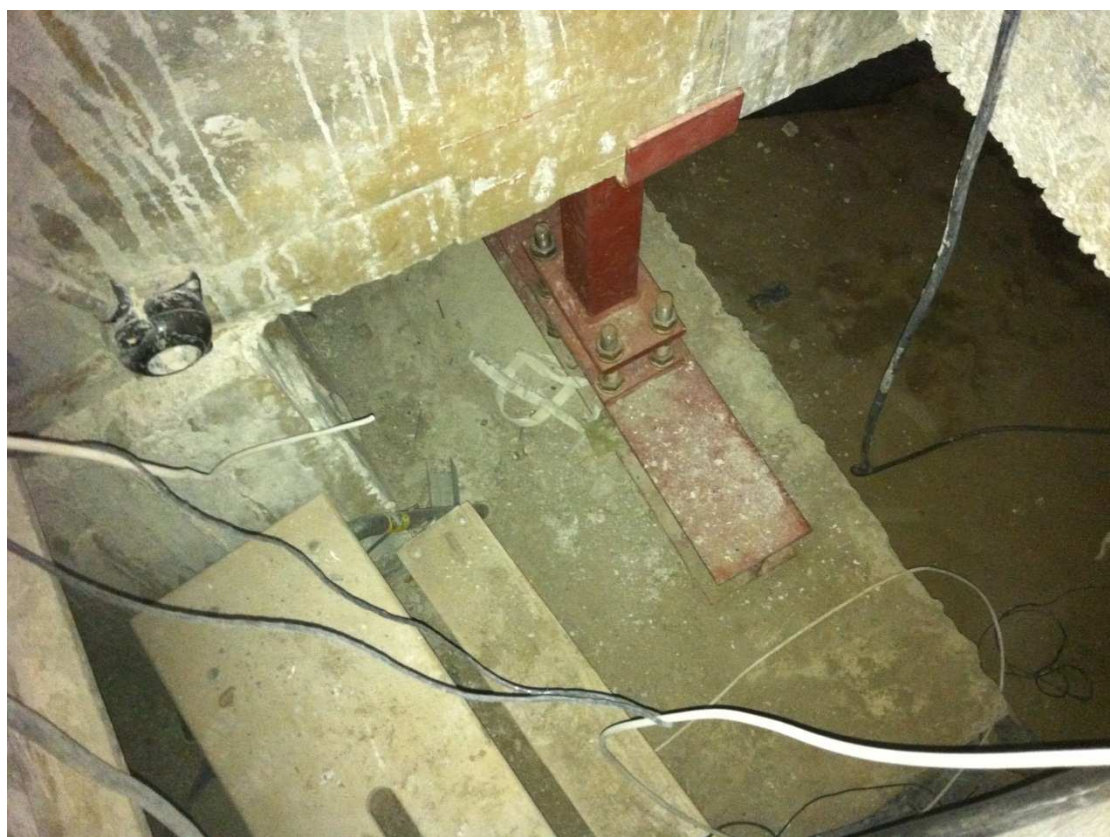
Steel beam supports at a plinth foundation, Fredslyckan
